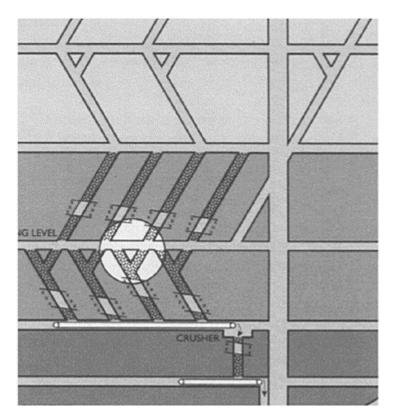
Typical layout of a South African Gold Mine ore pass system.
